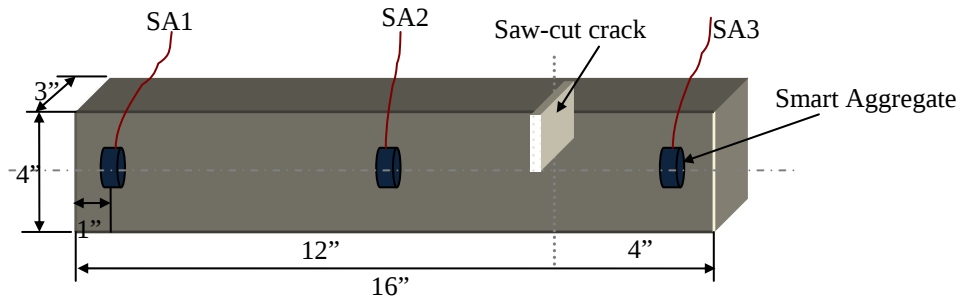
Artificially-induced Crack Notch in the RAC Beam Sample
